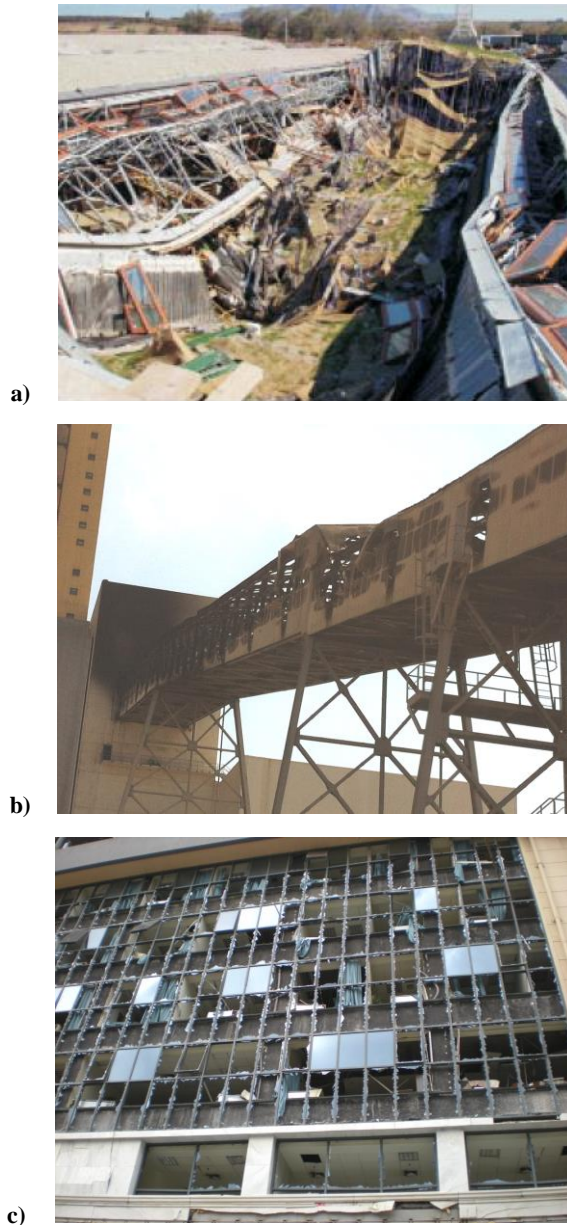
Examples of structural failure due to a) overloading, b) explosion, c) fire
